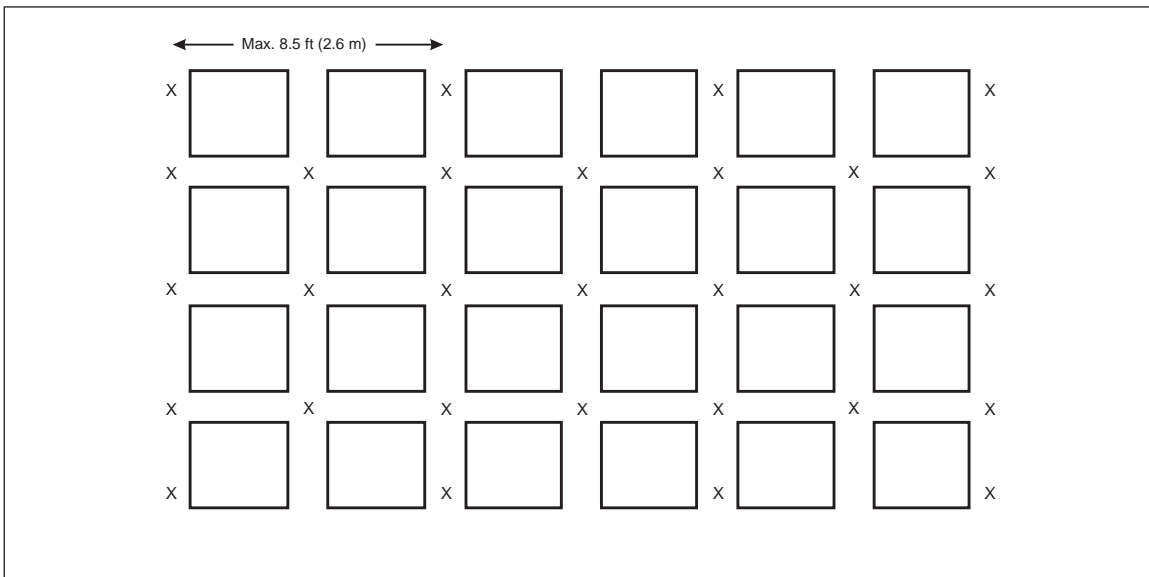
Plan view of alternative in-rack sprinkler arrangement for multiple-row racks
